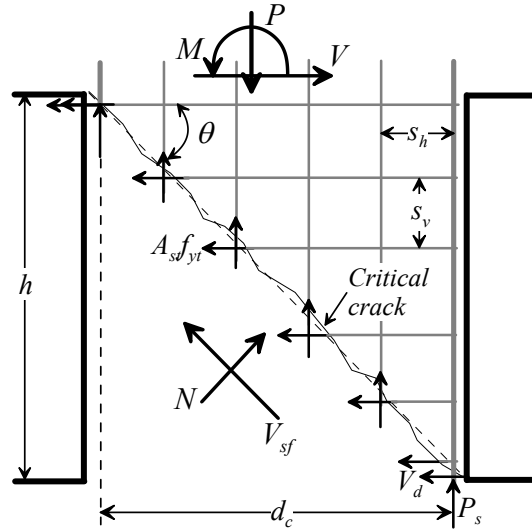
Free body diagram of a cracked wall pier.
